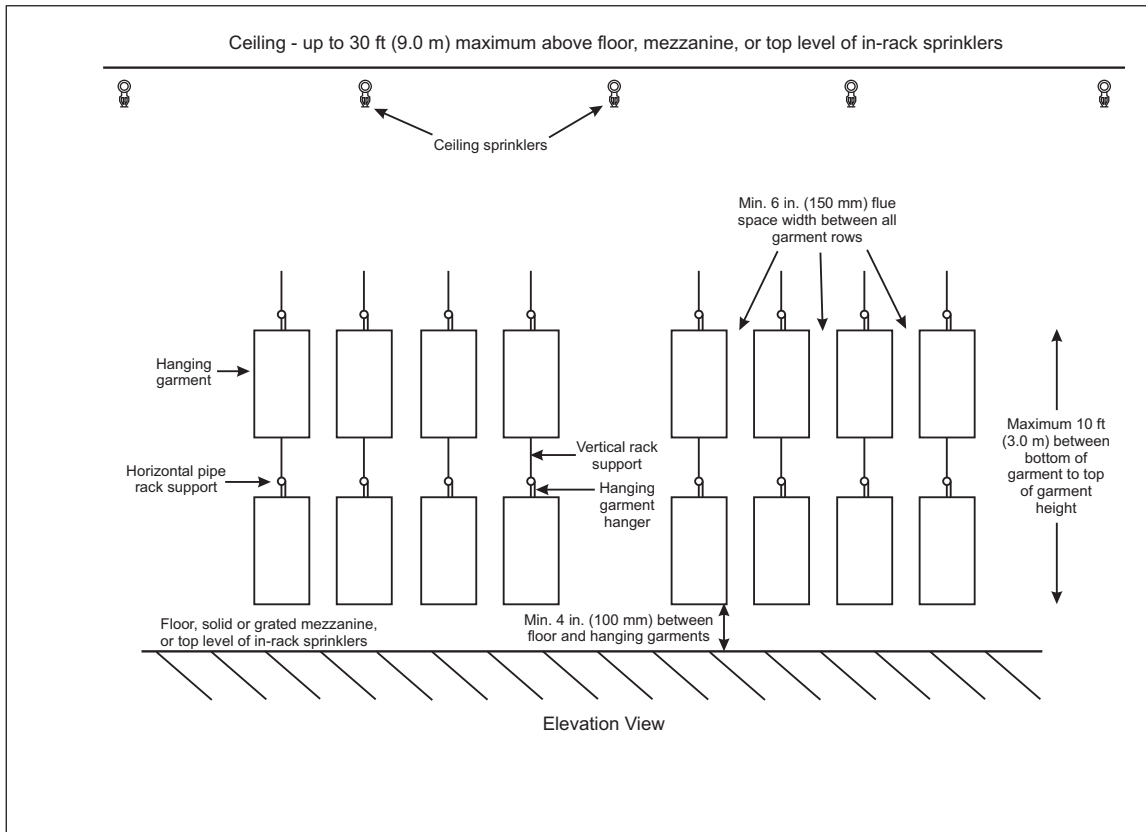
Ceiling-only protection, maximum 30 ft (9.0 m) ceiling, maximum 10 ft (3.0 m) storage, and minimum 6 in. (150 mm) flue space between garment rows (applies to Table 3)
